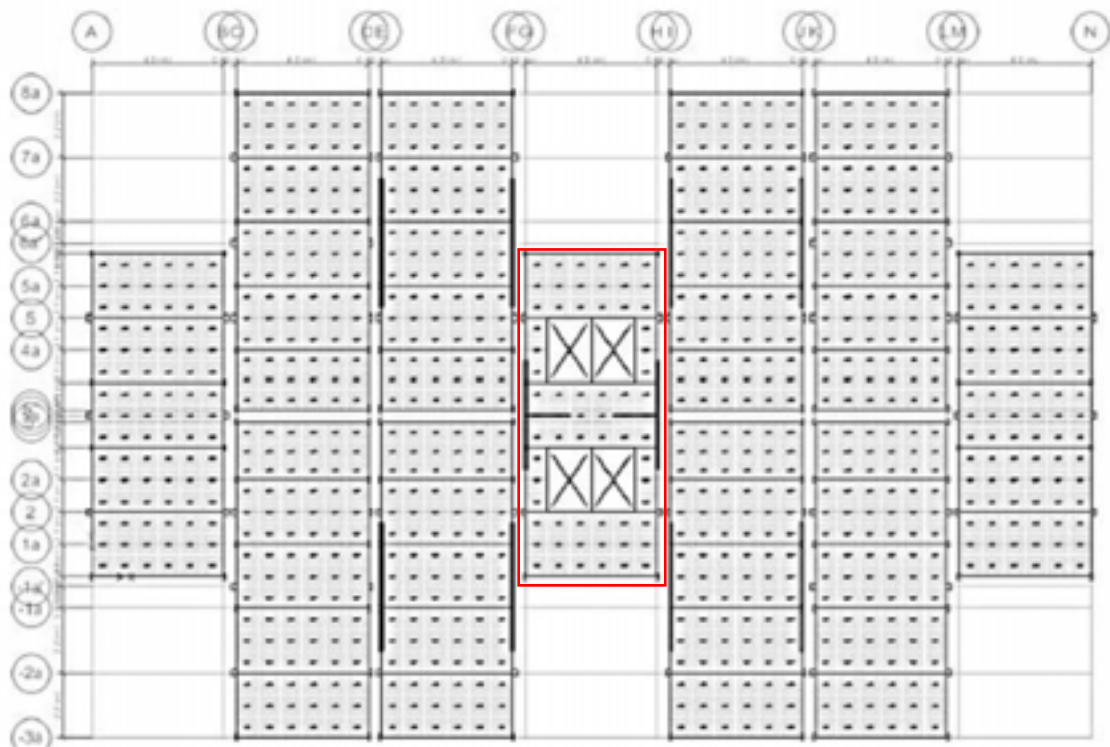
Floor plan of the modular multi-storey building considered for the case study
